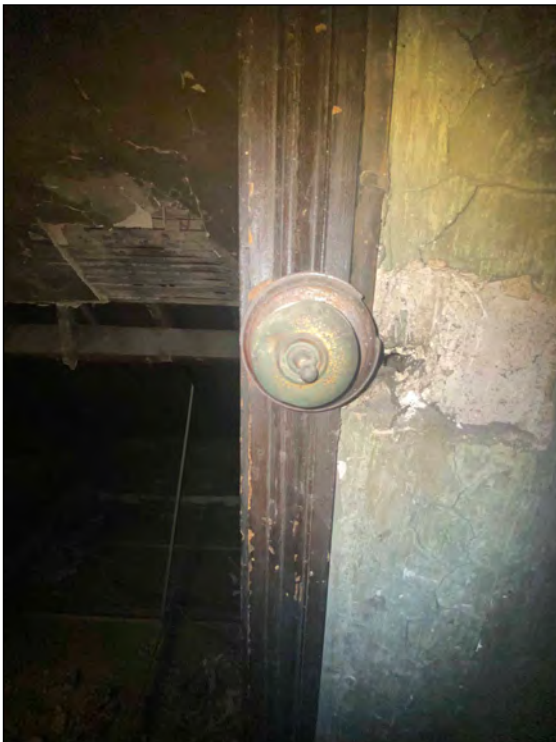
View looking SSE at detail of early-mid 20th century crabtree bakelite toggle light-switch in NW room of attic space.
